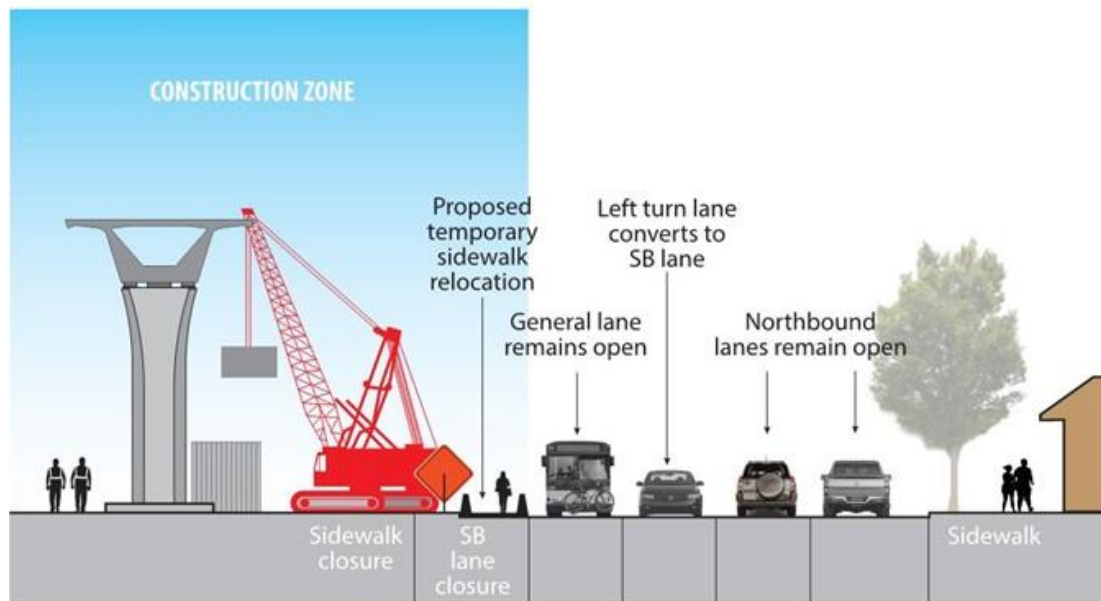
Construction of Elevated Guideway on Side of Roadway (Typical Cross Section)
